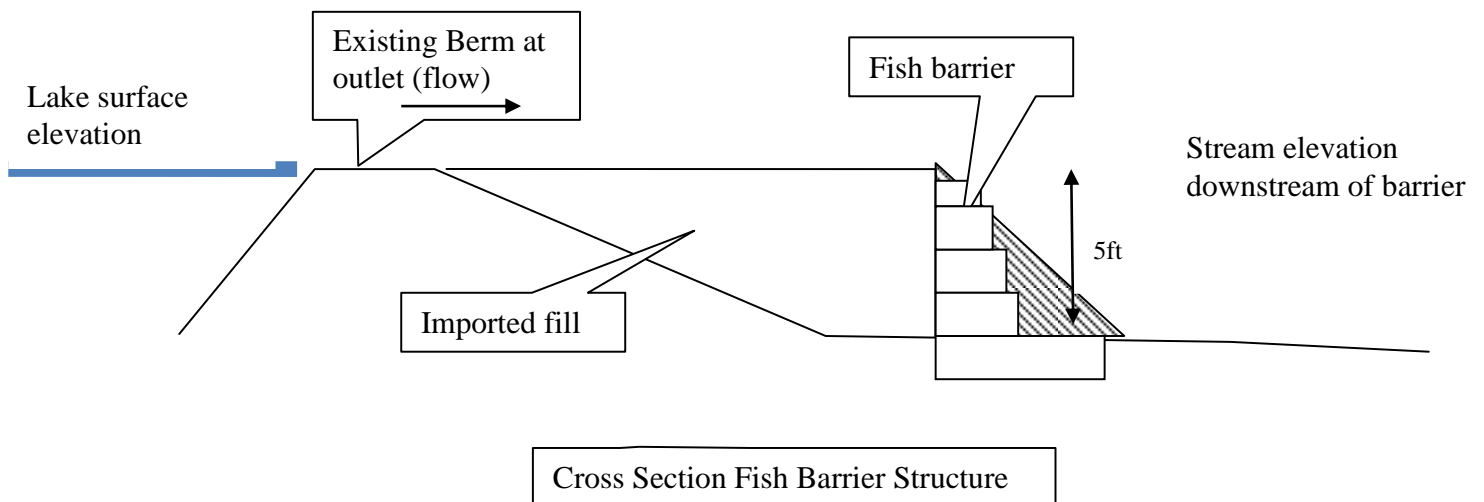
Cross section of the proposed fish barrier at the outlet of Van Houten Lake.
